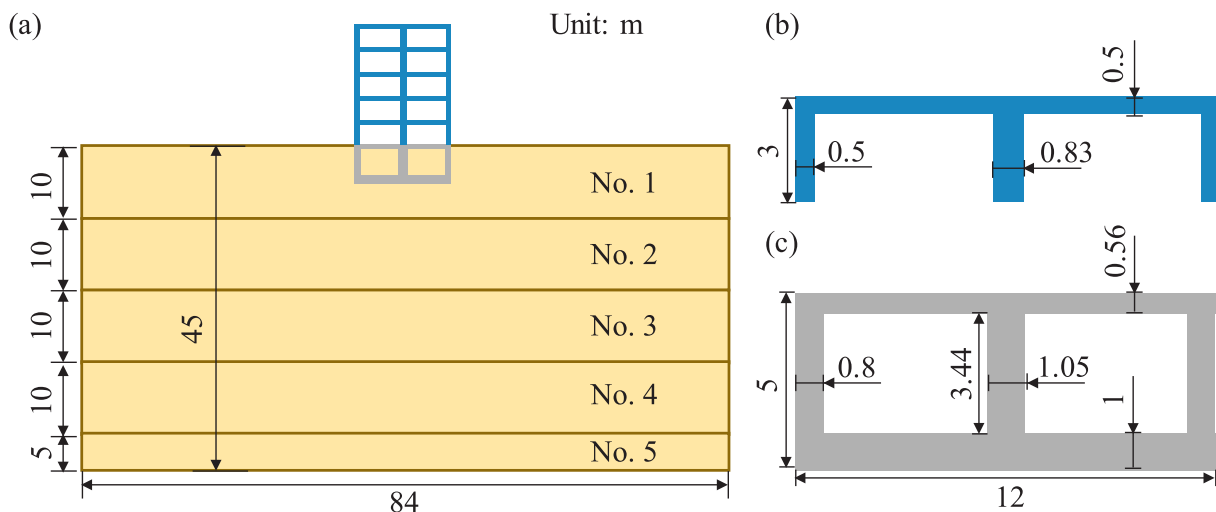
Numerical model of IUASS. (a) Structure system with aboveground structure, underground structure, and 5 soil layers, (b) one story of the aboveground structure, and (c) underground structure with two spans.
